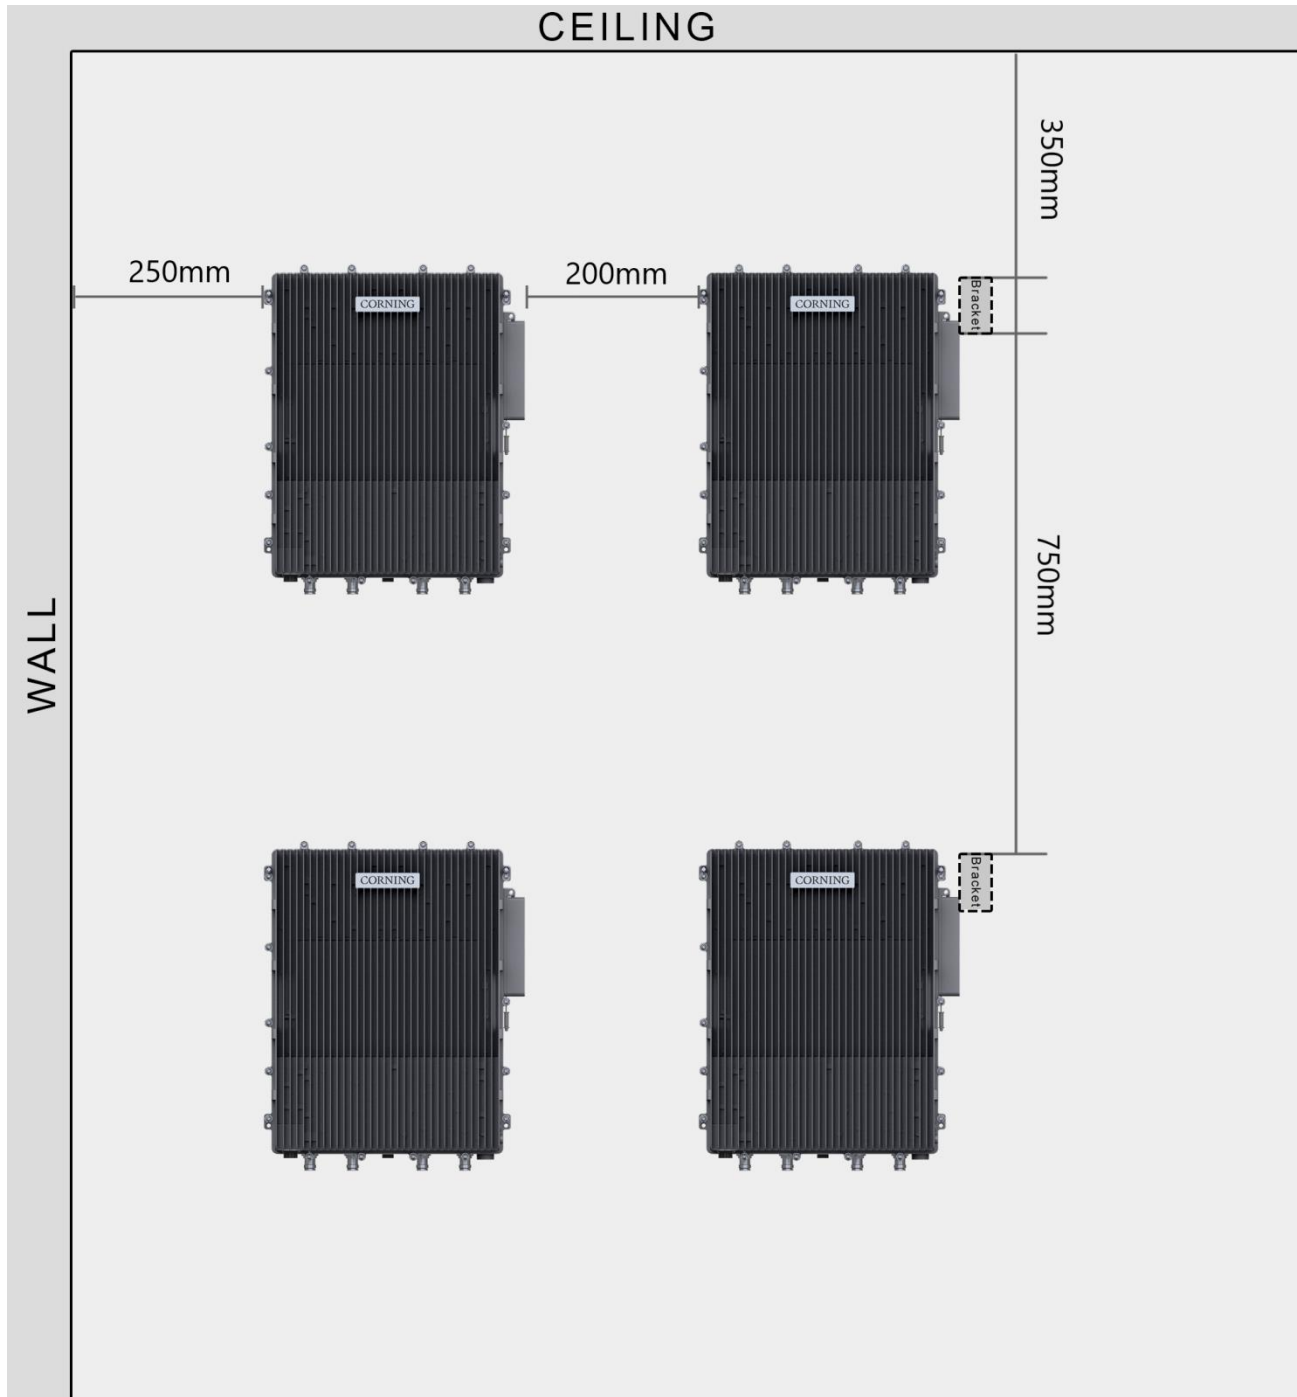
E62-X3 Wall Mounting Dimension Spacing
